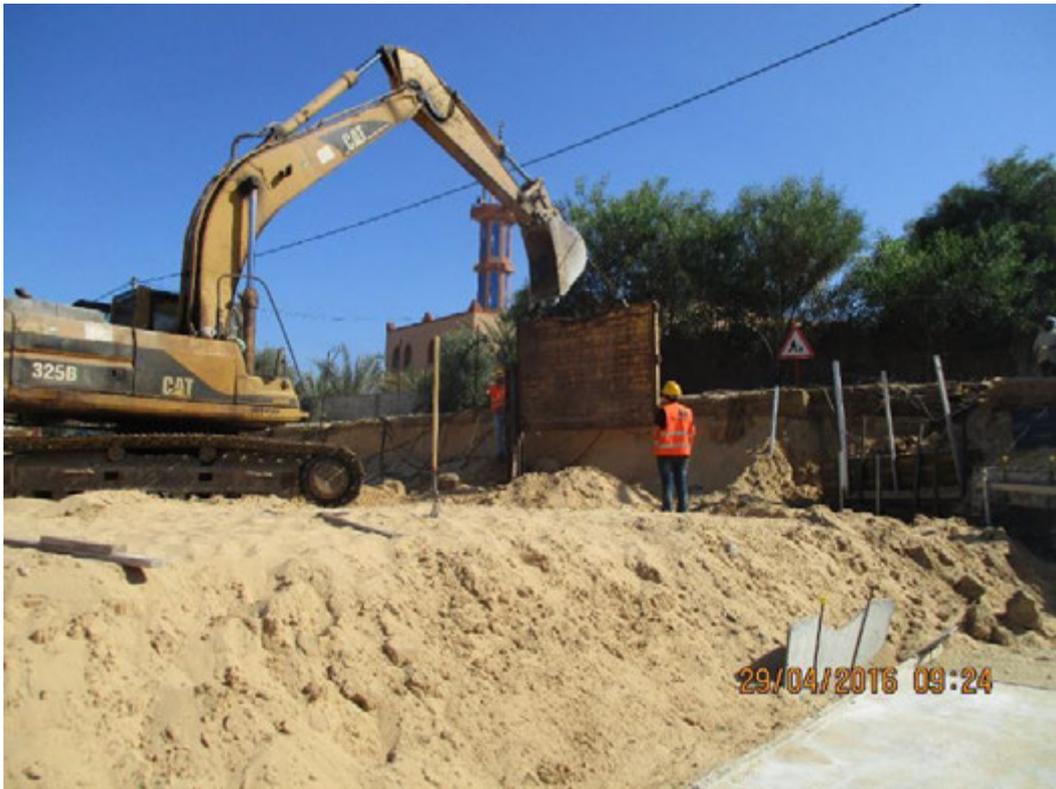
(Reinforcement Works for RW Foundation 1-2, 2-3.)
